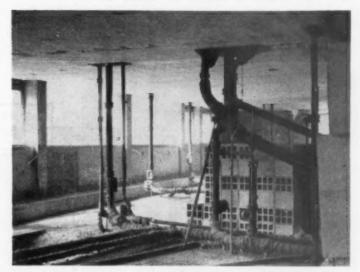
Drainage pipes brought across the deep first-floor tray so as to avoid downpipes at perimeter of open ground floor
